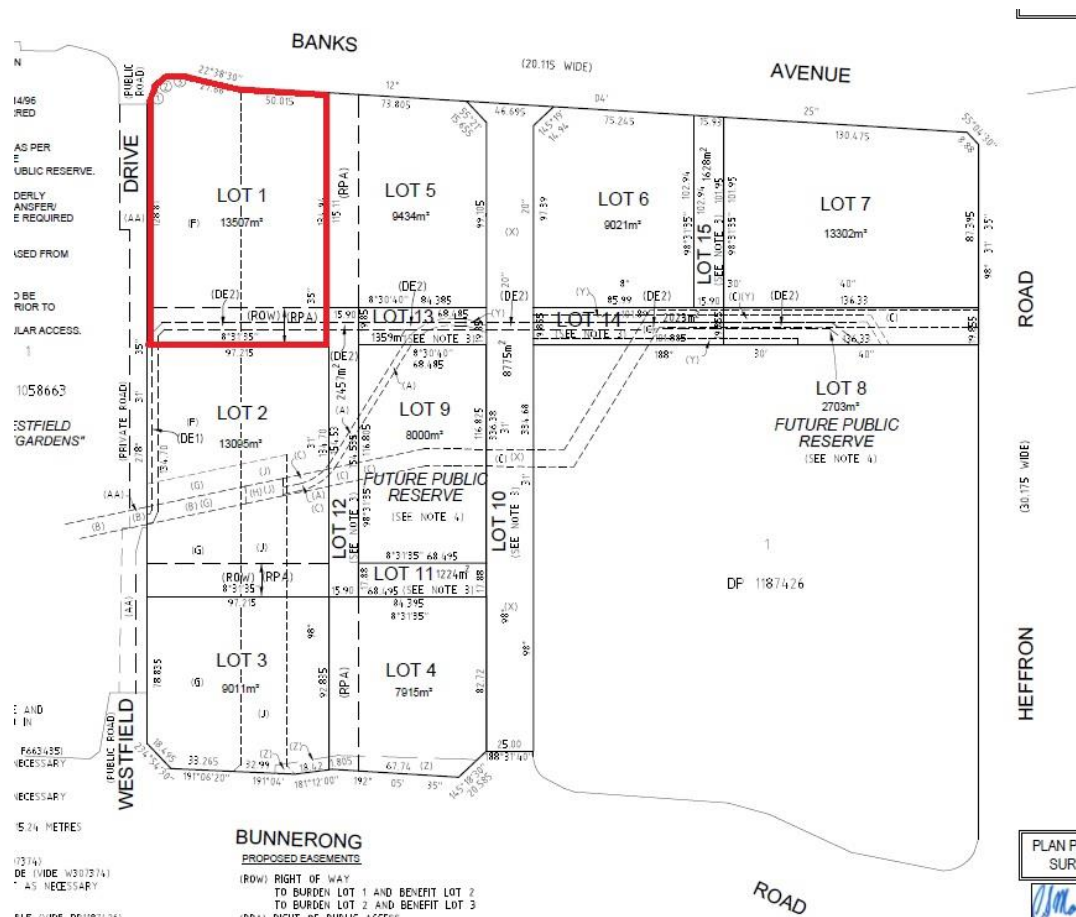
Approved subdivision plan (DA-15/104) with UB5W outlined.
